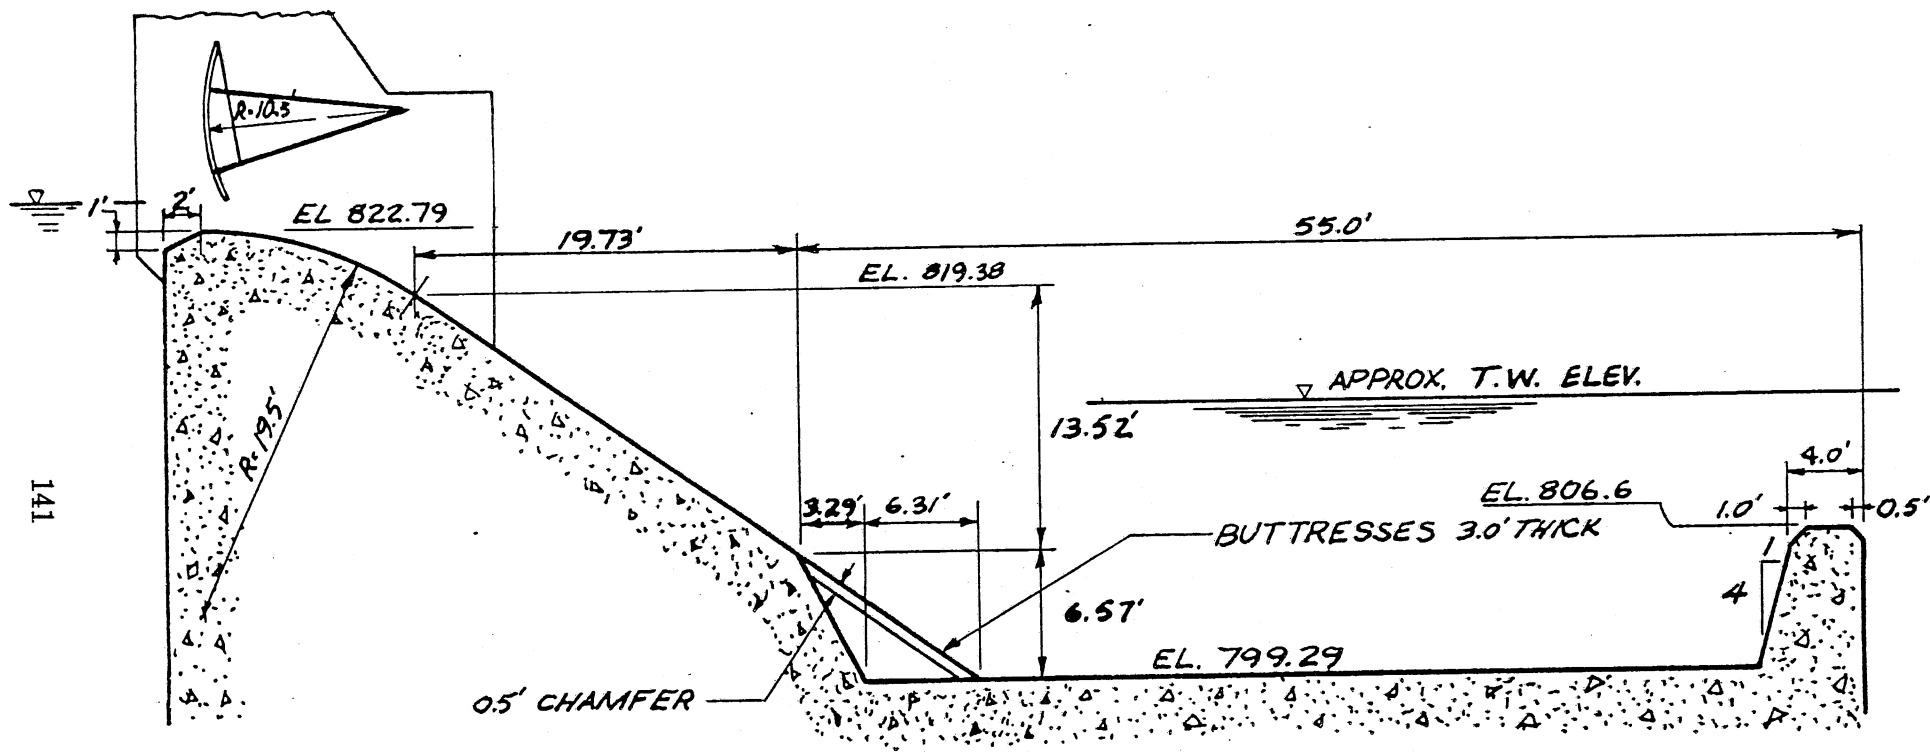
Cross section of tainter gate spillway Bay 13-28, right bank.
